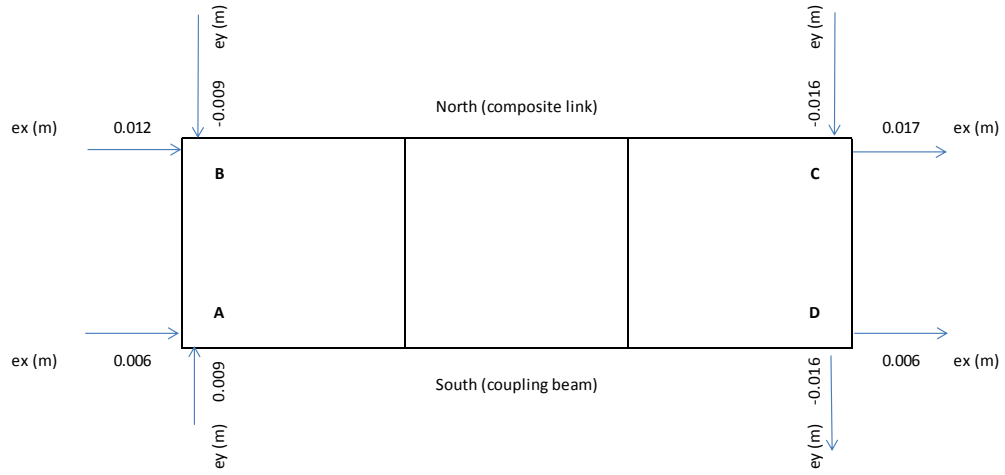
Out of plumb, 2nd measurement, 3rd floor
